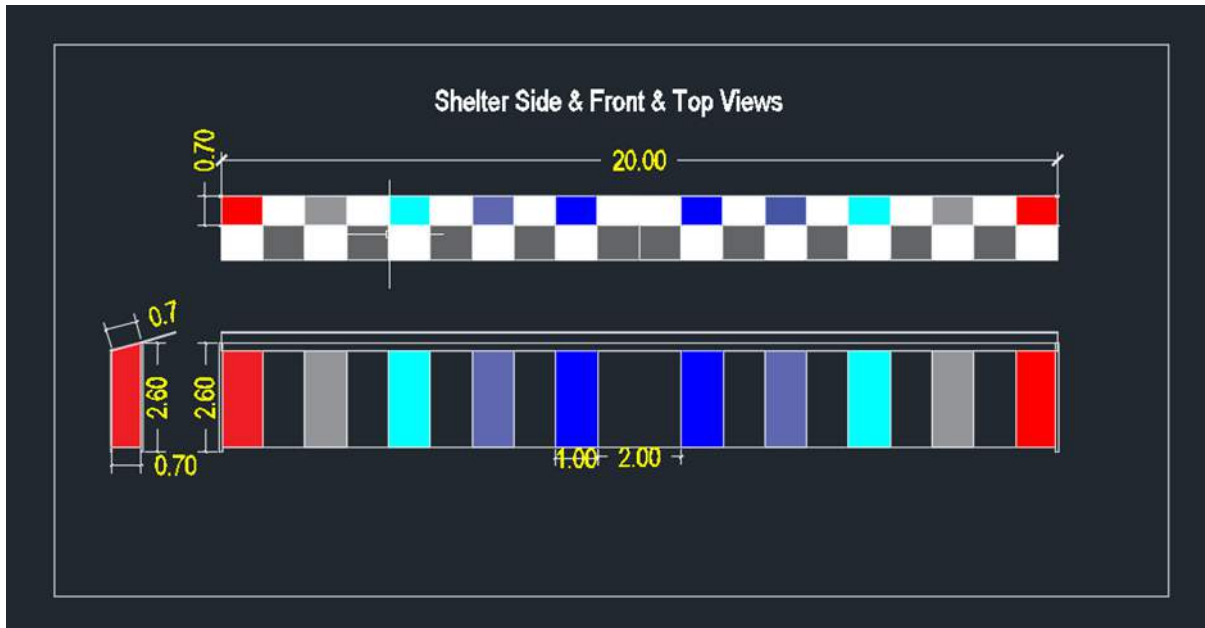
Engineering Drawing of Shelter (DPC Urban Planning 2017)
